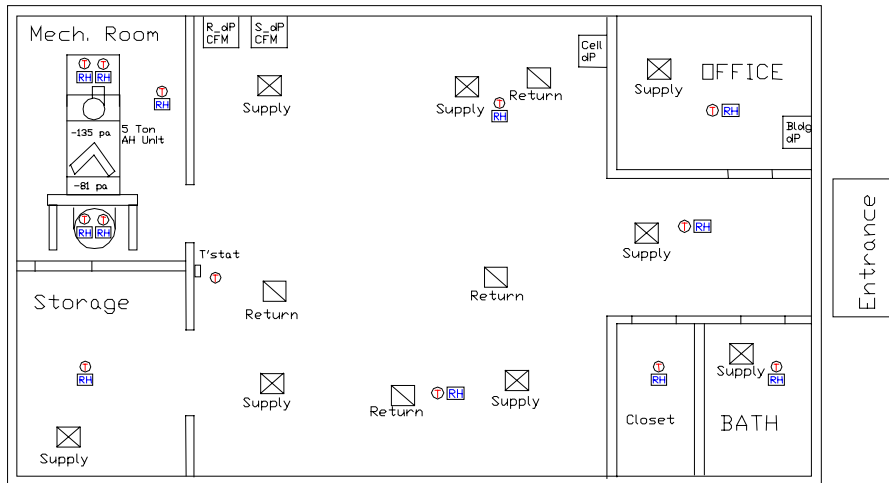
Floor Plan of Building Science Lab Building Showing Sensor Locations
